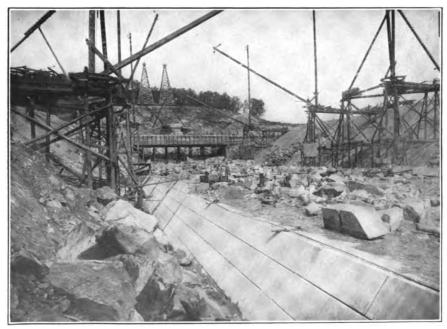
Fig. D.—Croton Falls dam. Cyclopean masonry with concrete block faces.
